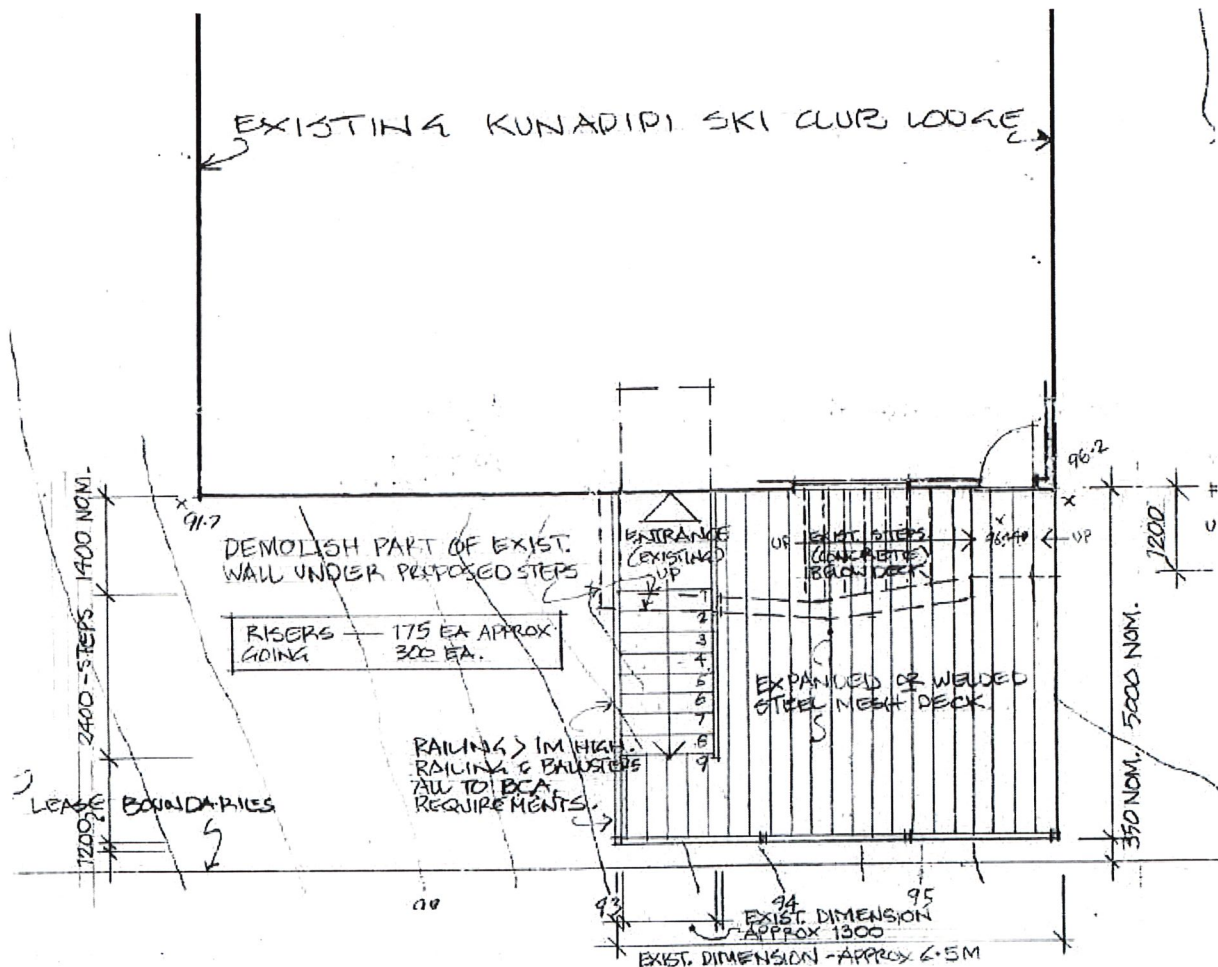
Proposed external deck works off north-east elevation (Source: Applicants documentation)
